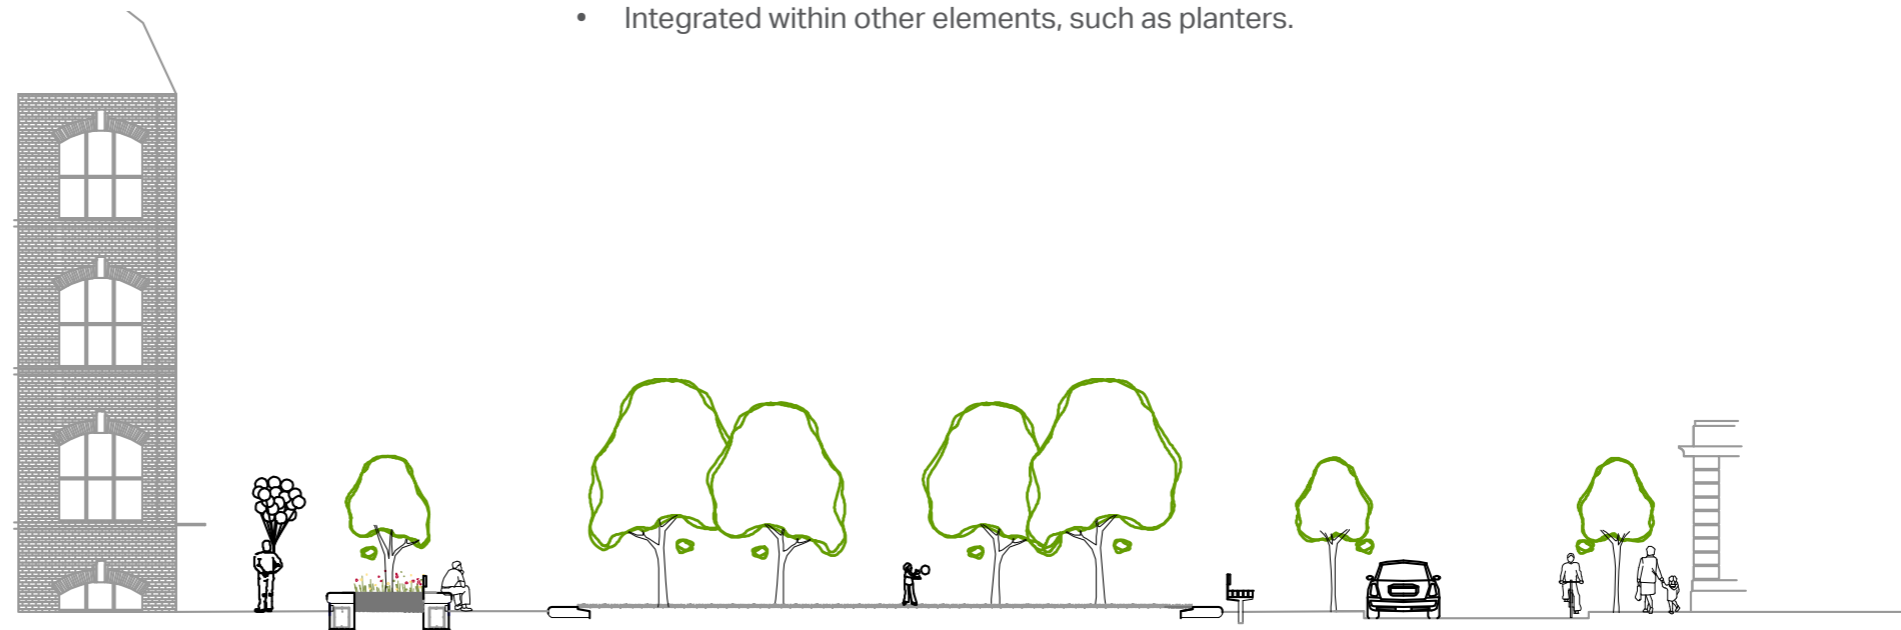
Cross section, showing how the public realm would interface with existing built development.
